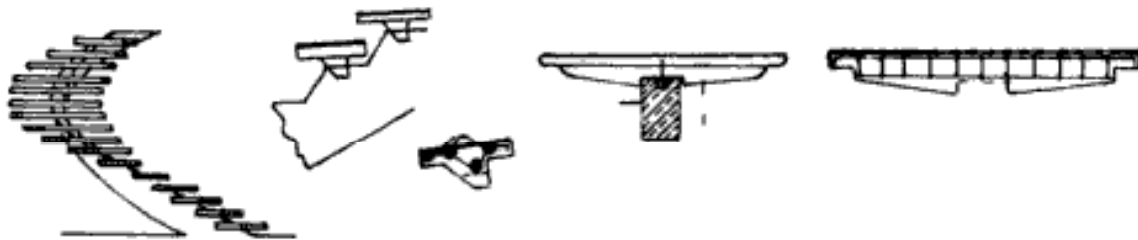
Reinforcement details for the steps of a typical helical stairs.
